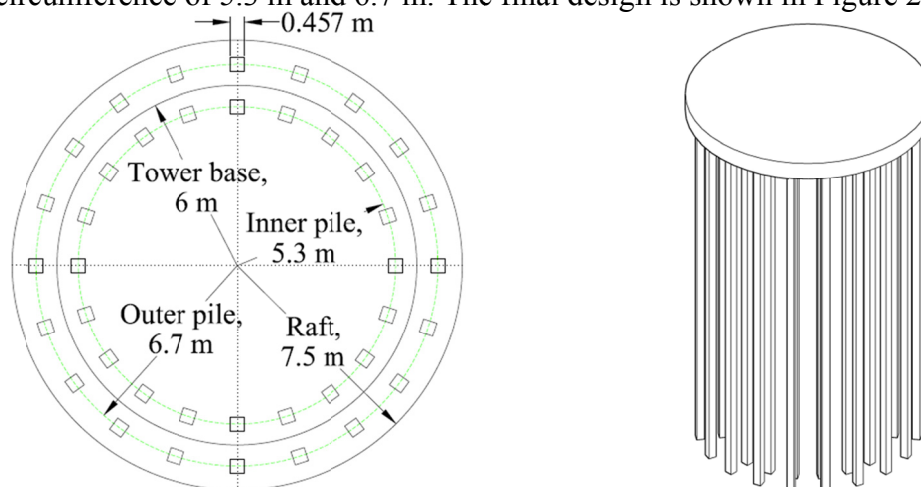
Plan view and 3-D view of designed piled-raft foundation
